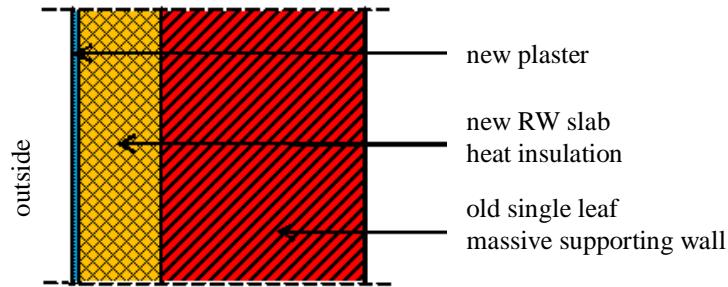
Simplified build-up of an originally single leaf massive external wall provided with plastered RW slab thermal insulation system.
